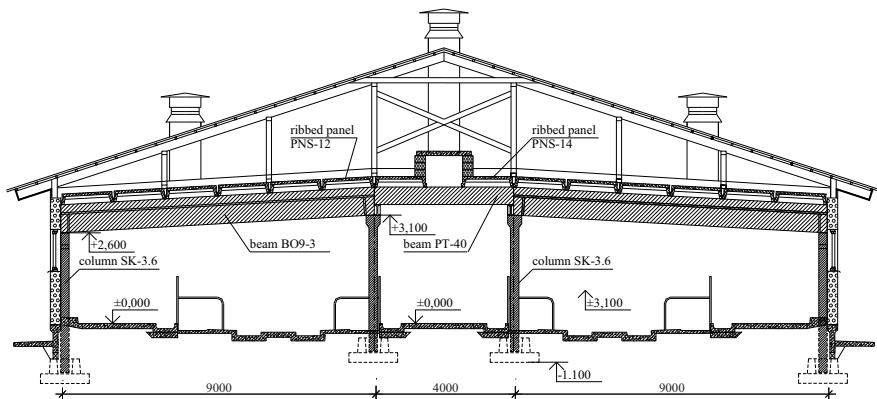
Cross-section of a reinforced concrete structure agricultural building
